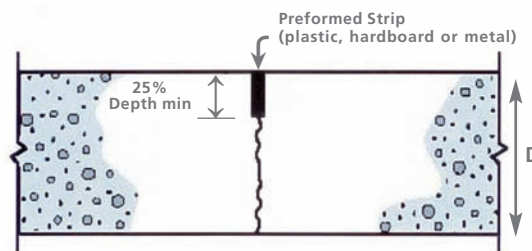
illustrates the premolded, unsealed insert method for filling contraction joints. These joints open and close with thermal movements. It is important to note that these unsealed, premolded joint fillers do not prevent water or chemicals from entering into the concrete crack. They offer no protection from corrosion. The main function of these types of joints is to induce controlled cracking in the concrete slab.
